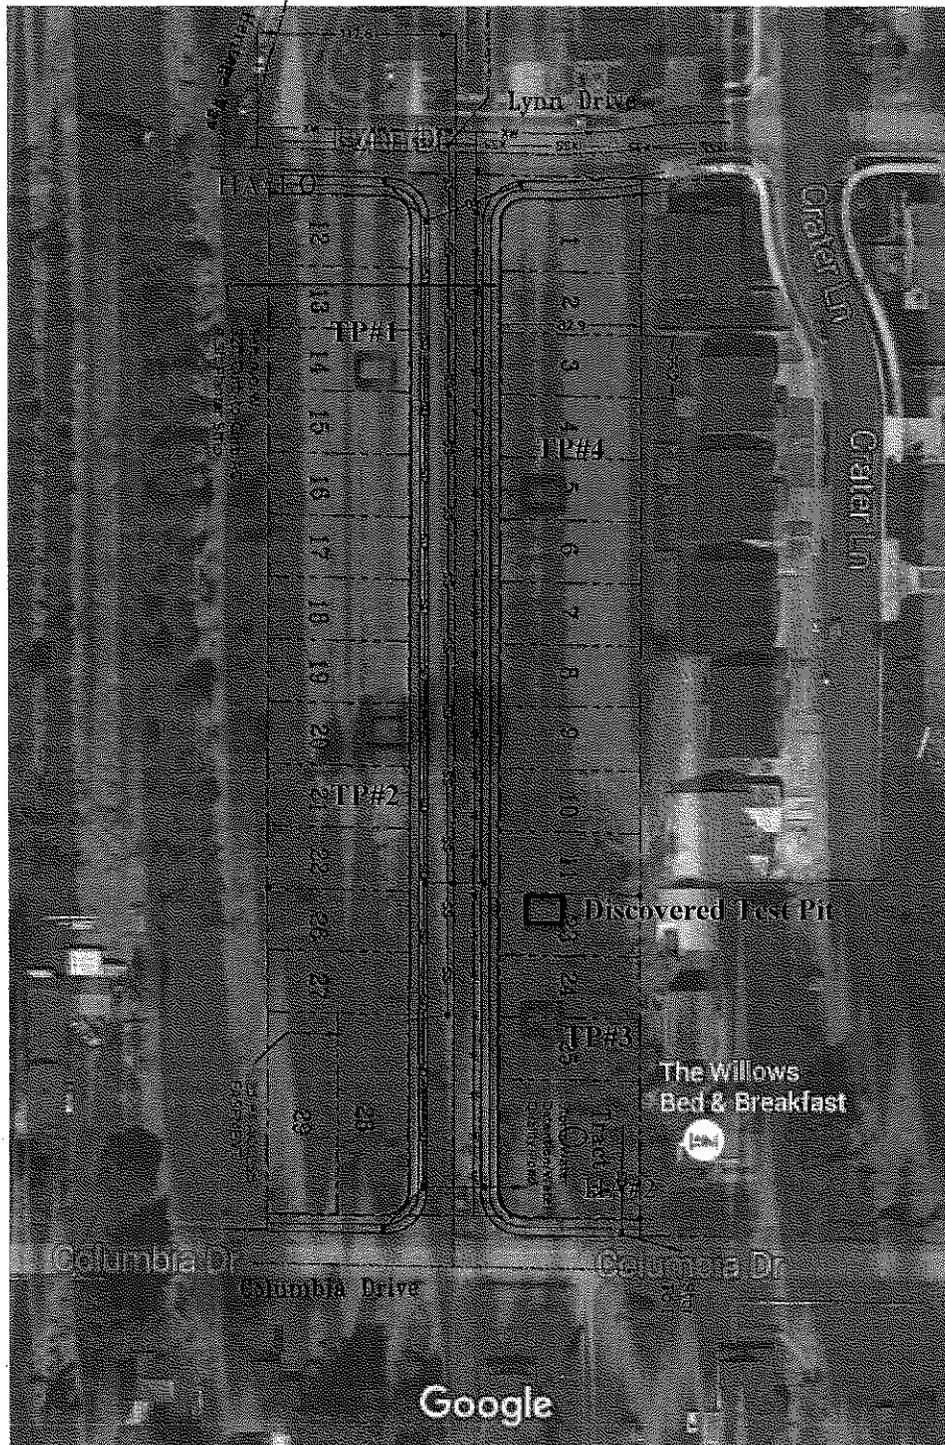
Site plan and aerial imagery with test pit and hand auger locations overlaid
